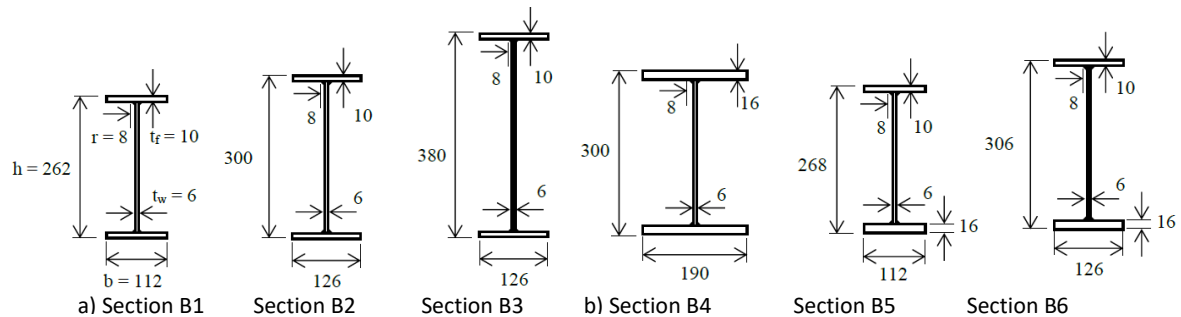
Nominal cross-sectional dimensions of S690 welded I-sections
